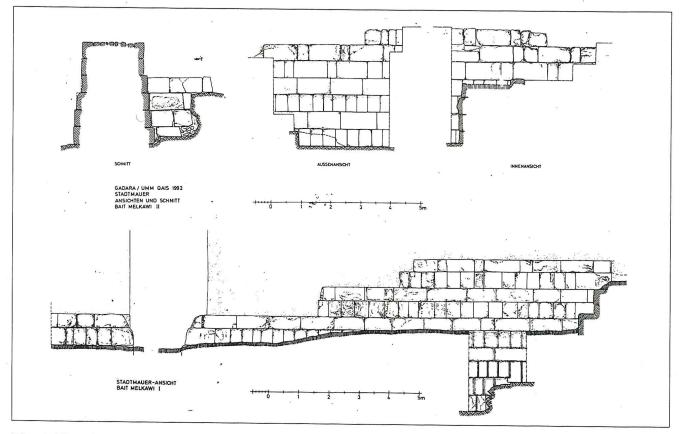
The city wall in area XLII and under Bait Melkawi, details.
